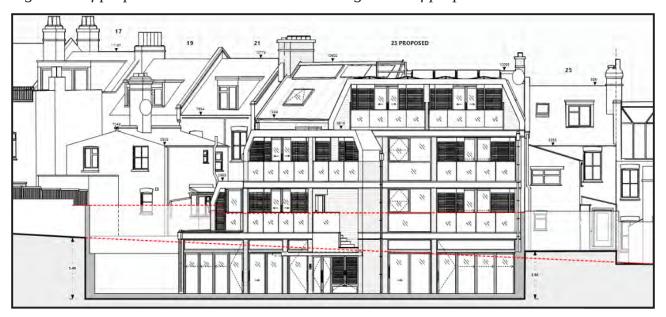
Rear elevation: Predominantly facing the railway with 1½ stories below wall level.
